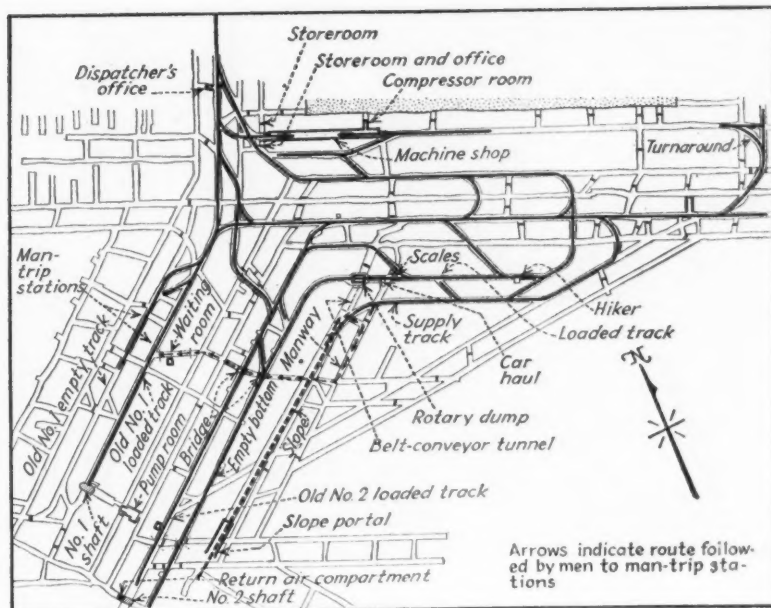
General plan of new bottom at Isabella in relation to previous bottom layouts.
